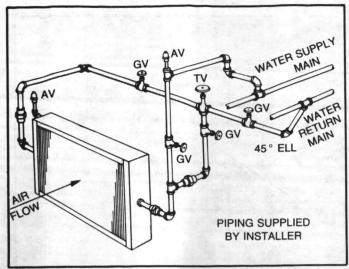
Typical Piping for Type W or WA, 1-Row Water Coil
